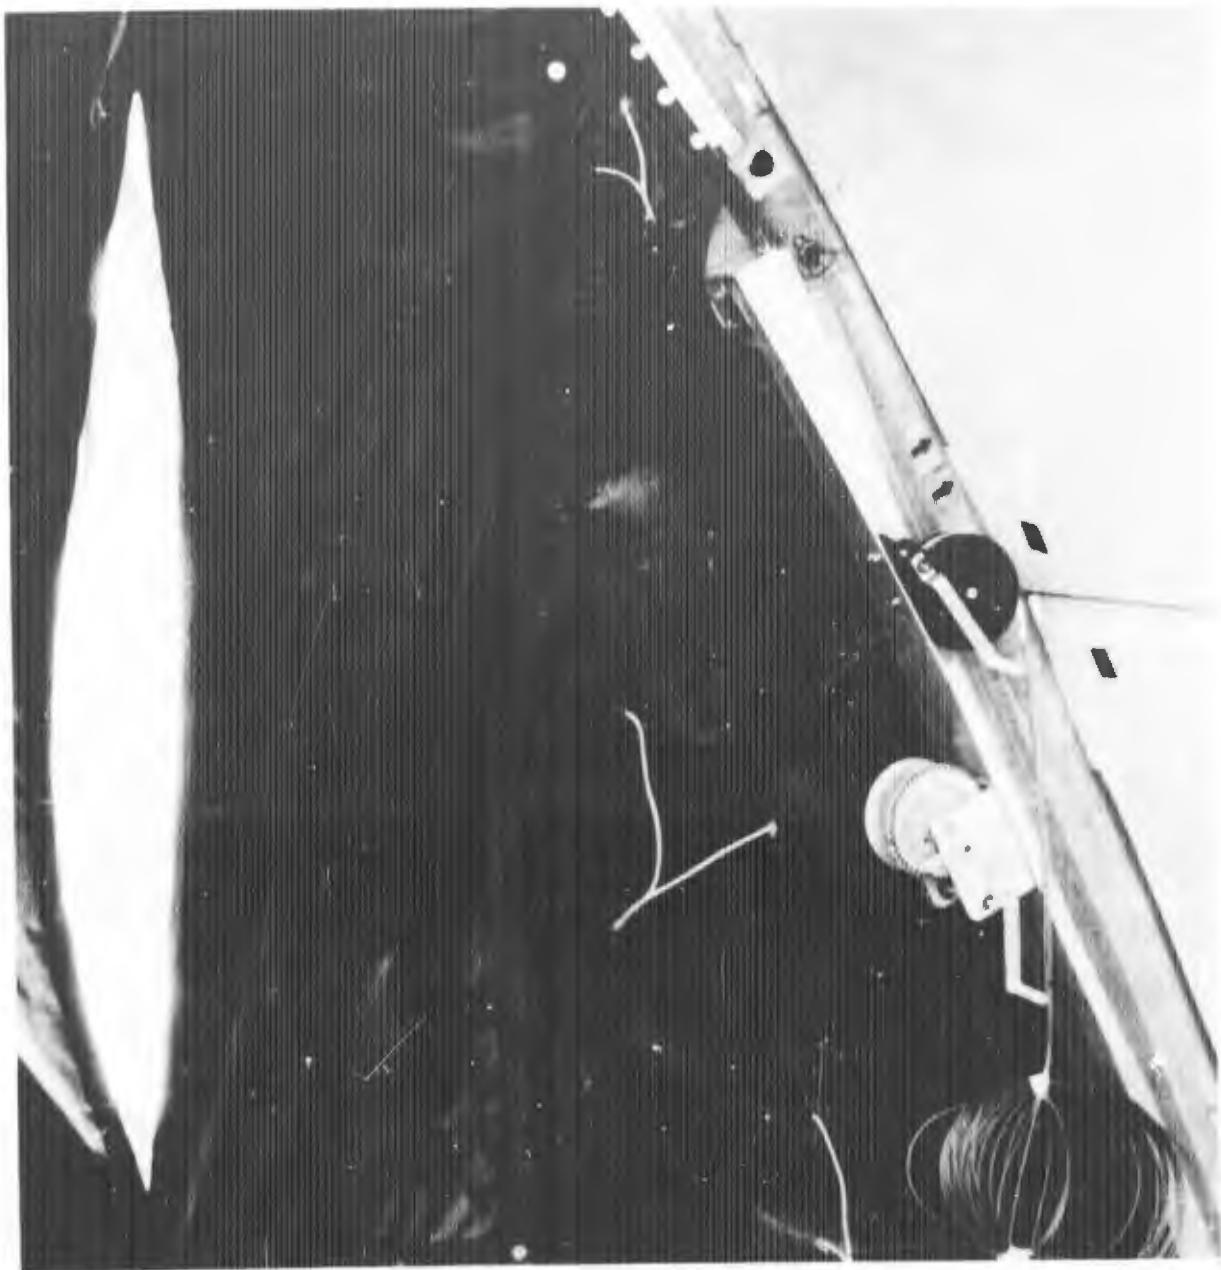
Fabric Door Cable Winch, Personnel Door Side of Shelter
